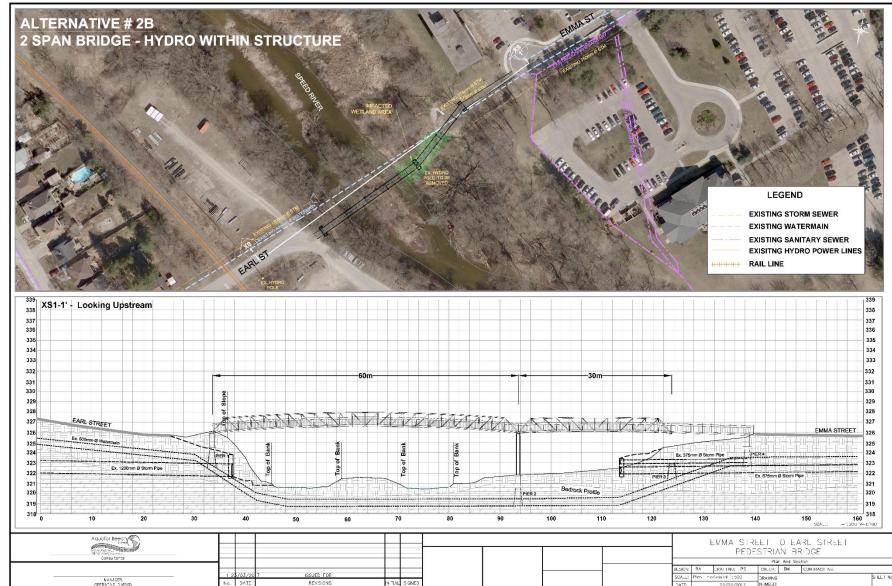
Alternative 2b: Double Span Steel Truss Bridge Through Hydro Corridor (Hydro within Structure)
